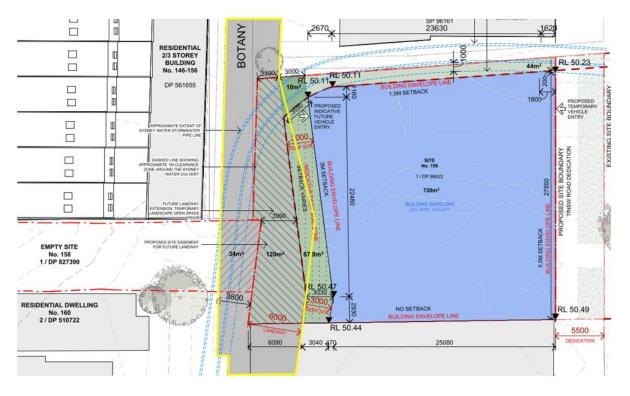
Proposed concept plan and laneway configuration, with the DCP alignment outlined in yellow for comparison
